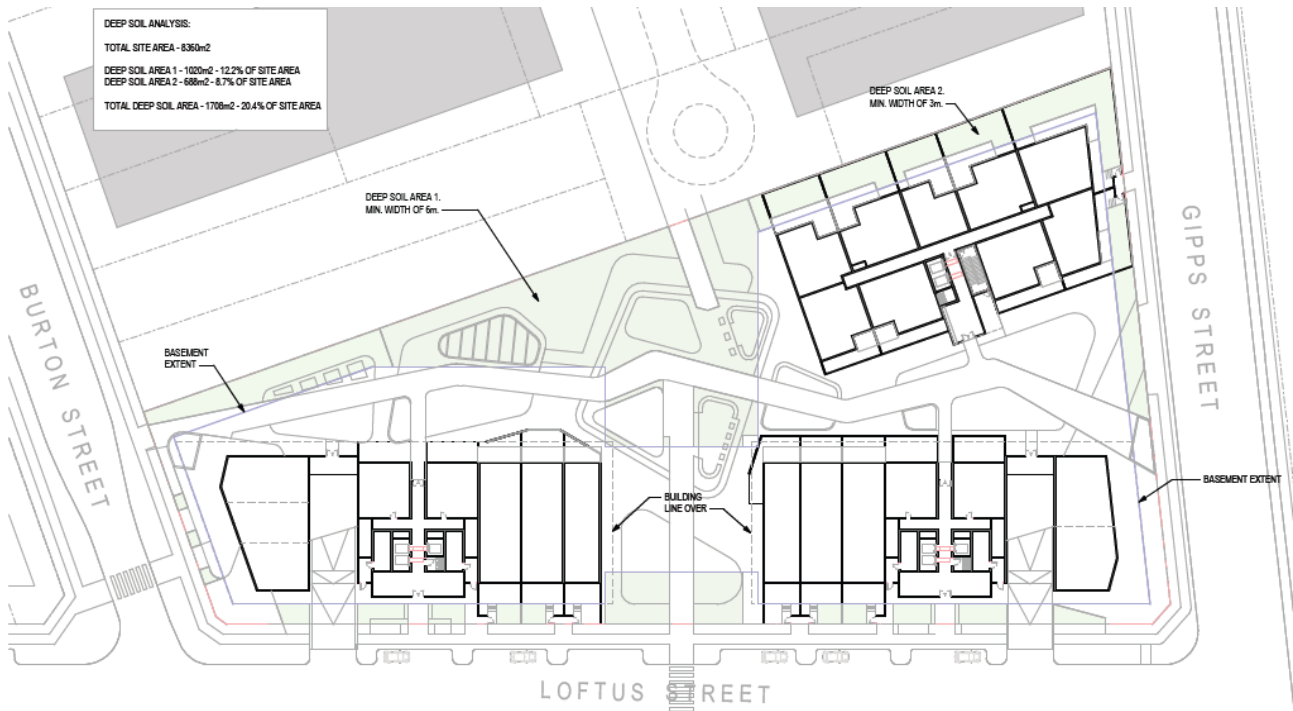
Proposed deep soil plan (Proposal Urban Design Report)
